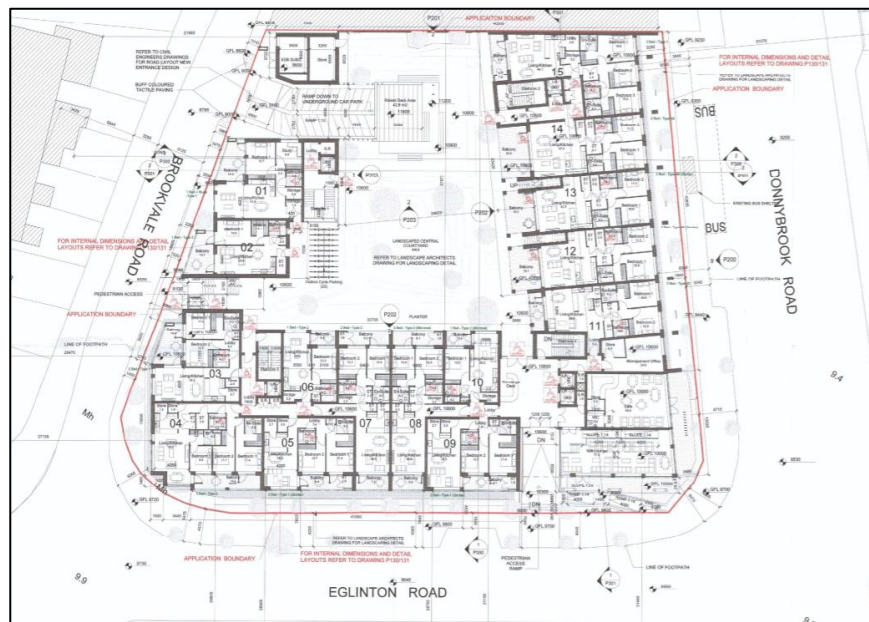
Proposed Ground Floor Plan - 1, 3, 5, 7, 9 and 11, Eglinton Road © 2020 Dublin County Council
